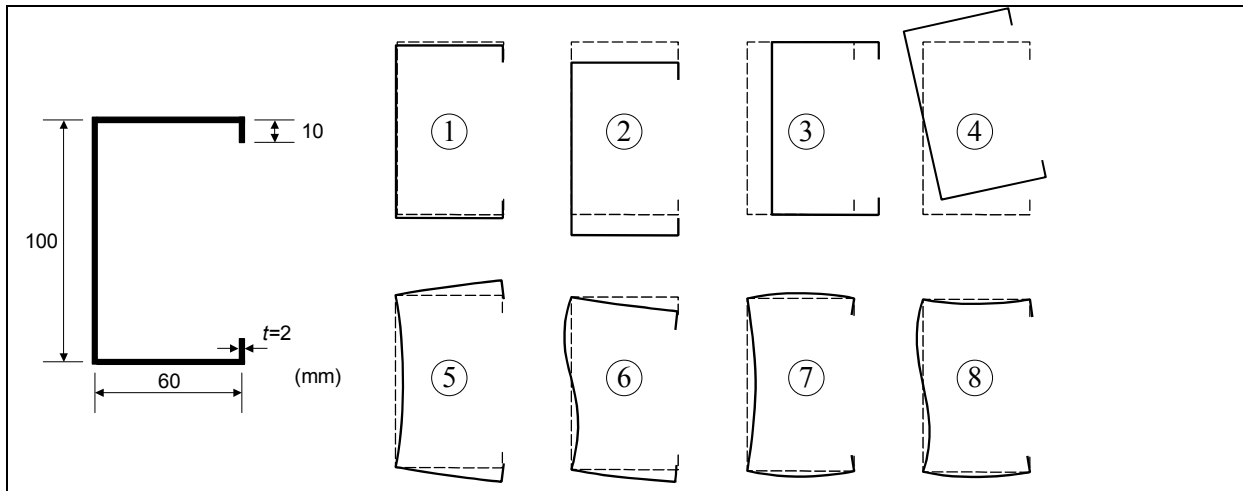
C-section column cross-section geometry and first eight GBT deformation mode shapes
